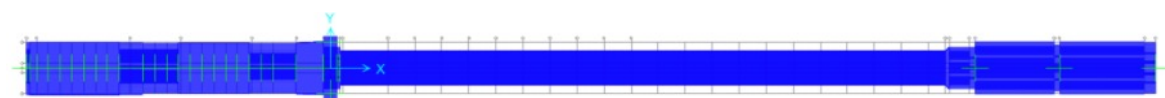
Plan view of FEM of New Kömürhan Bridge.
